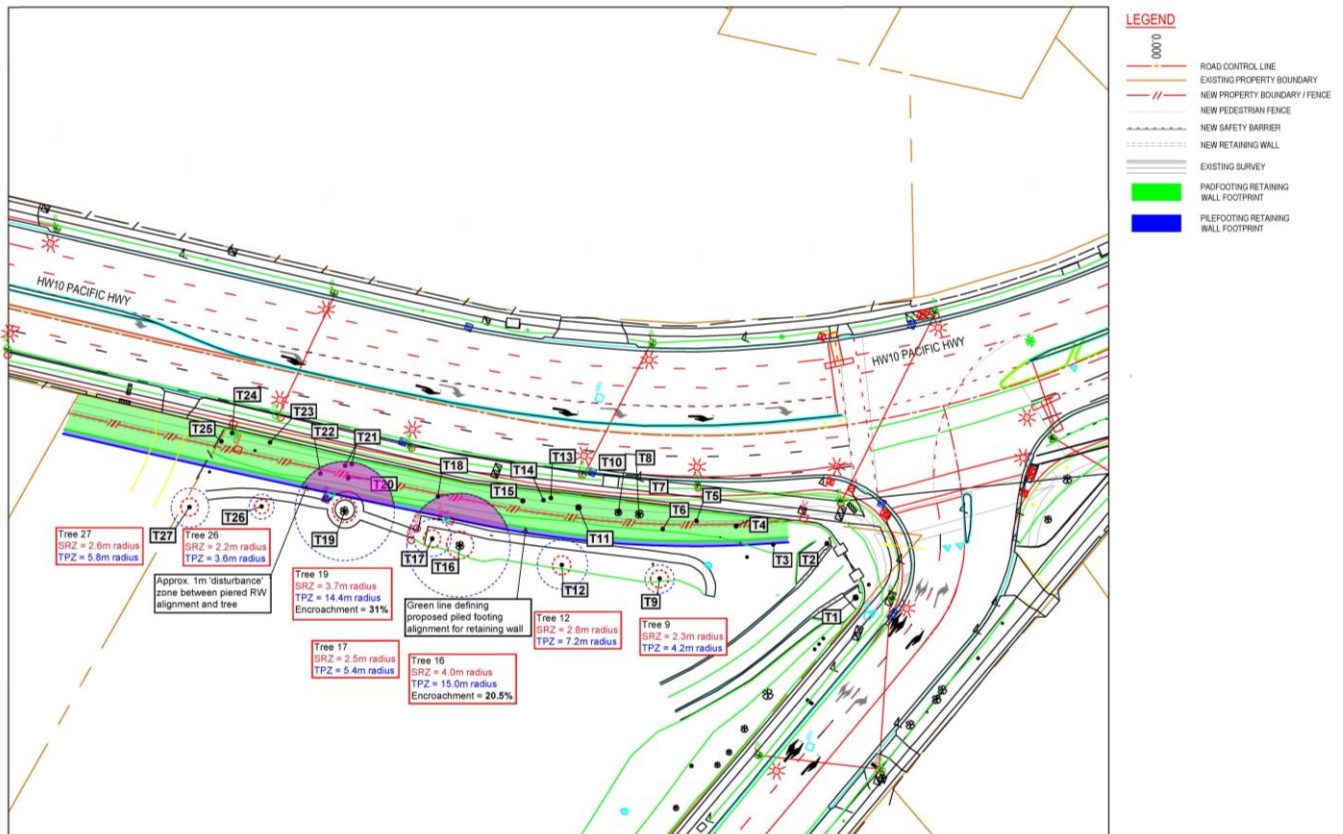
Plan drawing of proposed pad footing retaining wall and impacted trees (Source: Roads and Maritime Services, 2018)
